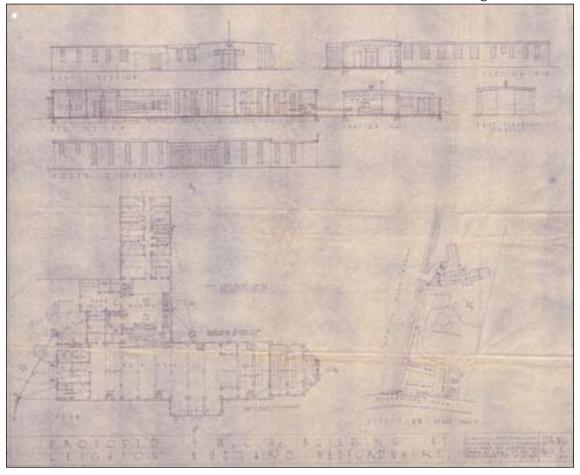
Proposed plan for the YWCA (TNA: PRO AIR 2/4813).
